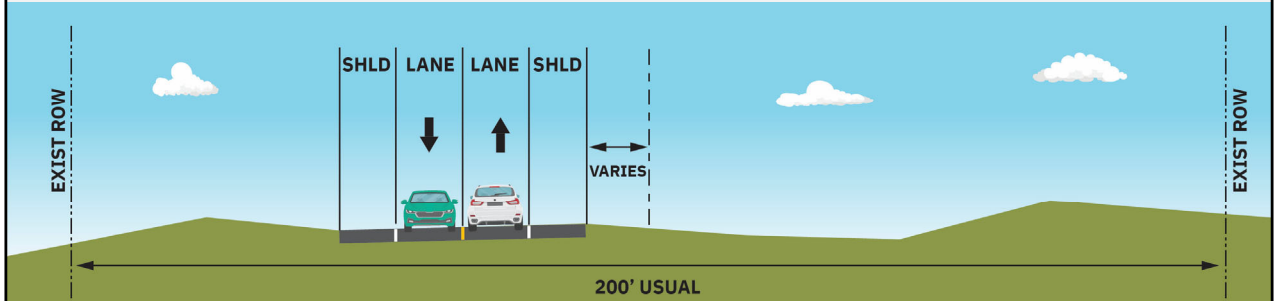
FM 156 existing typical section from Intermodal Parkway to Texan Drive, showing 2 undivided lanes each 12-foot wide, 10-foot-wide shoulders and a usual right of way of 200 feet.
